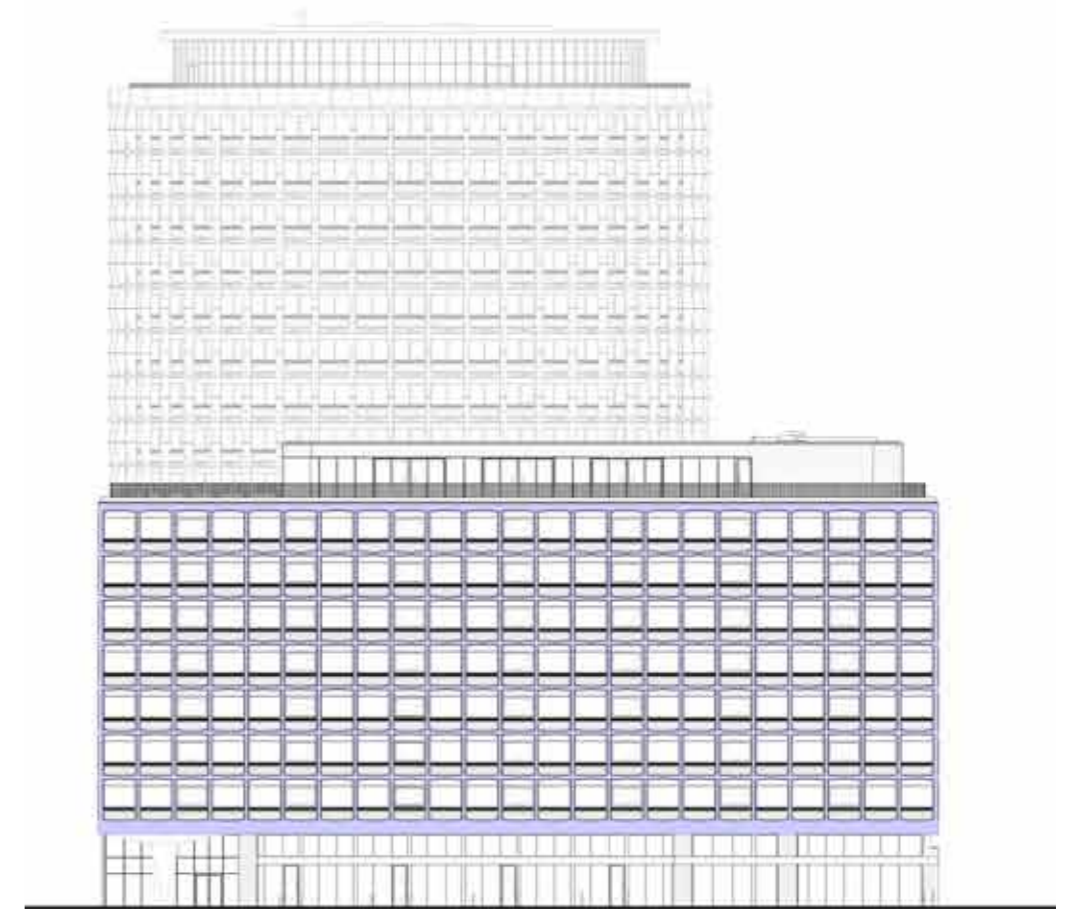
Kingsway West Elevation - MAT 13 location
